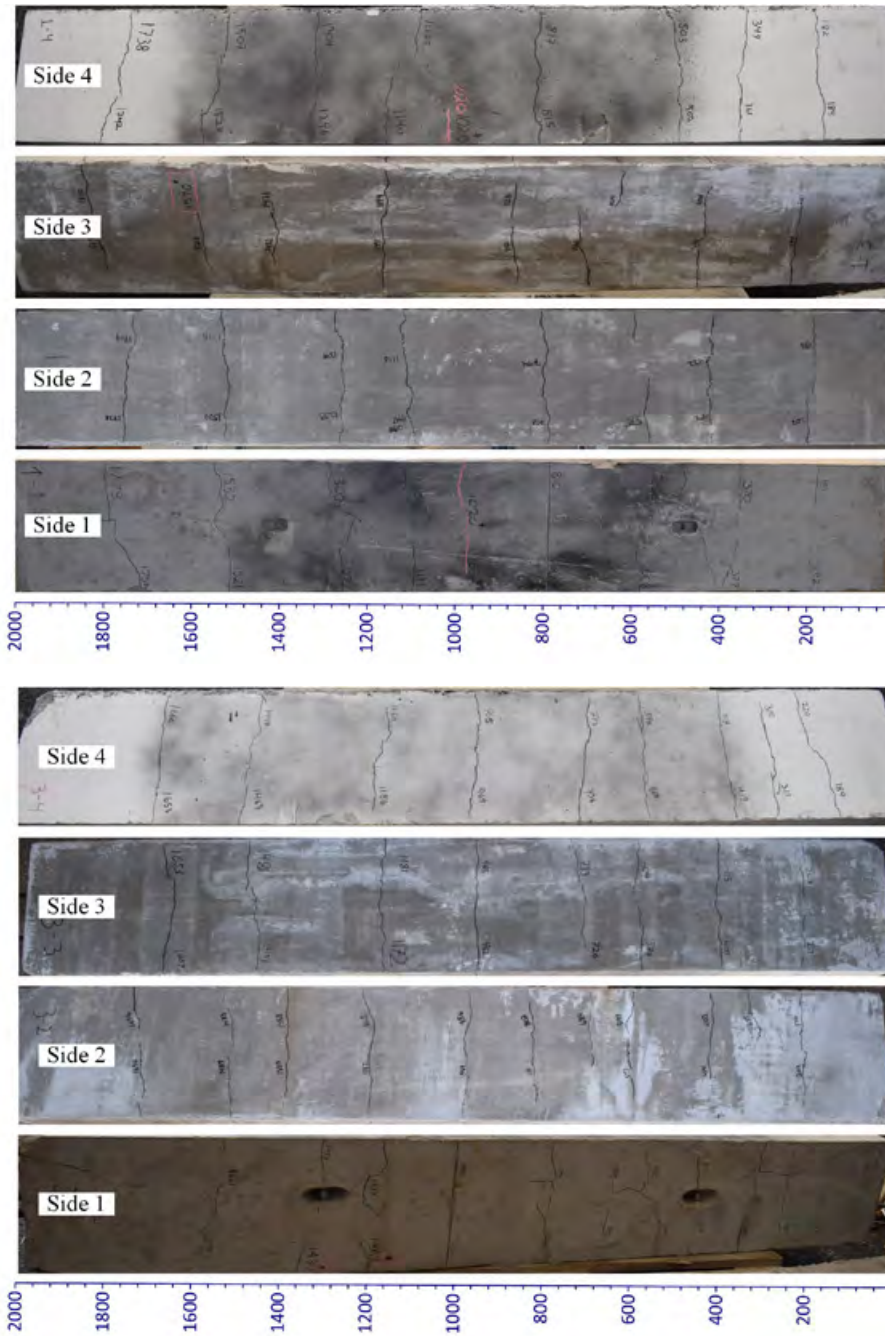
(c). Crack spacings of specimen set 4 (scale is in mm).
